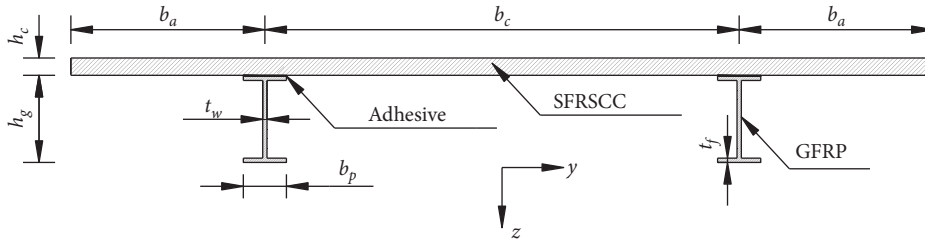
Cross-section of the two I-shaped GFRP with straight webs-concrete hybrid girder.
